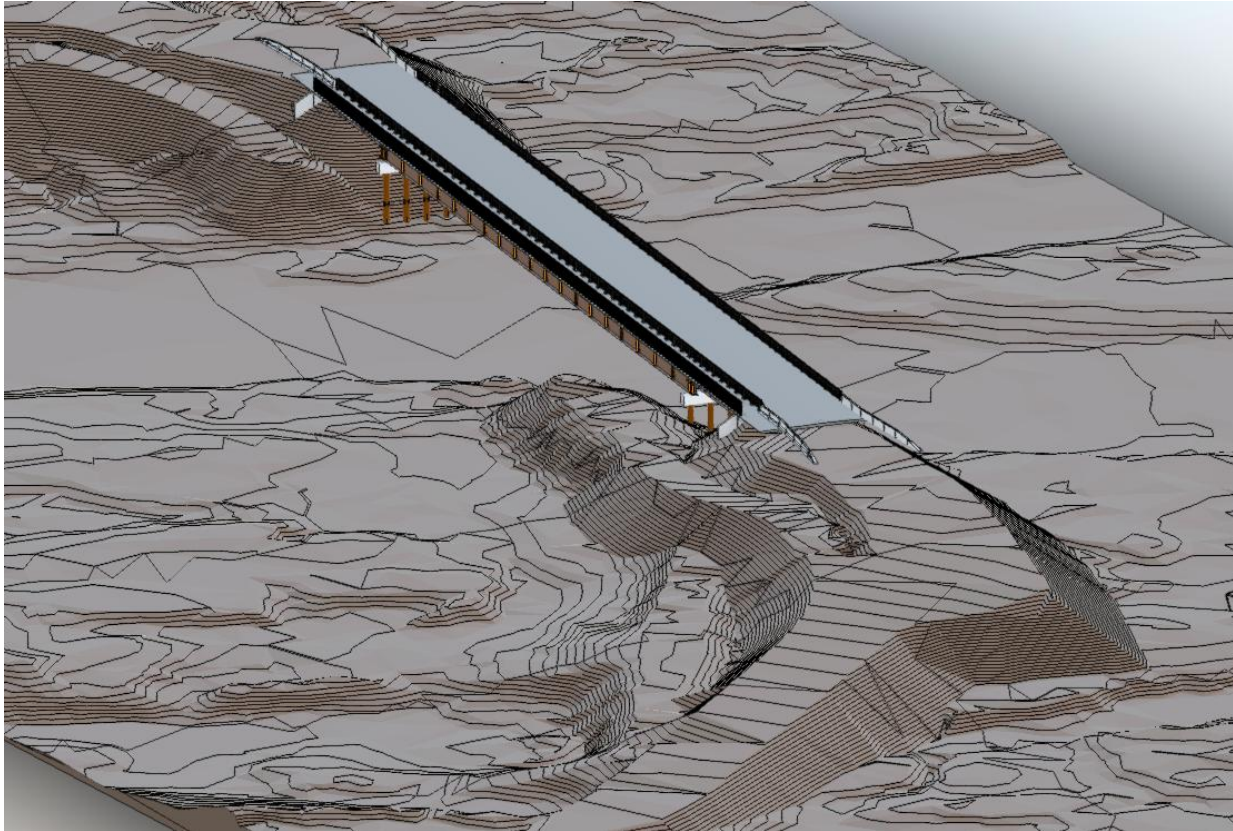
Isometric rendering of the Ksi Ginglox Bridge Revit model, showing the launch bed on right/south side of the bridge span.
